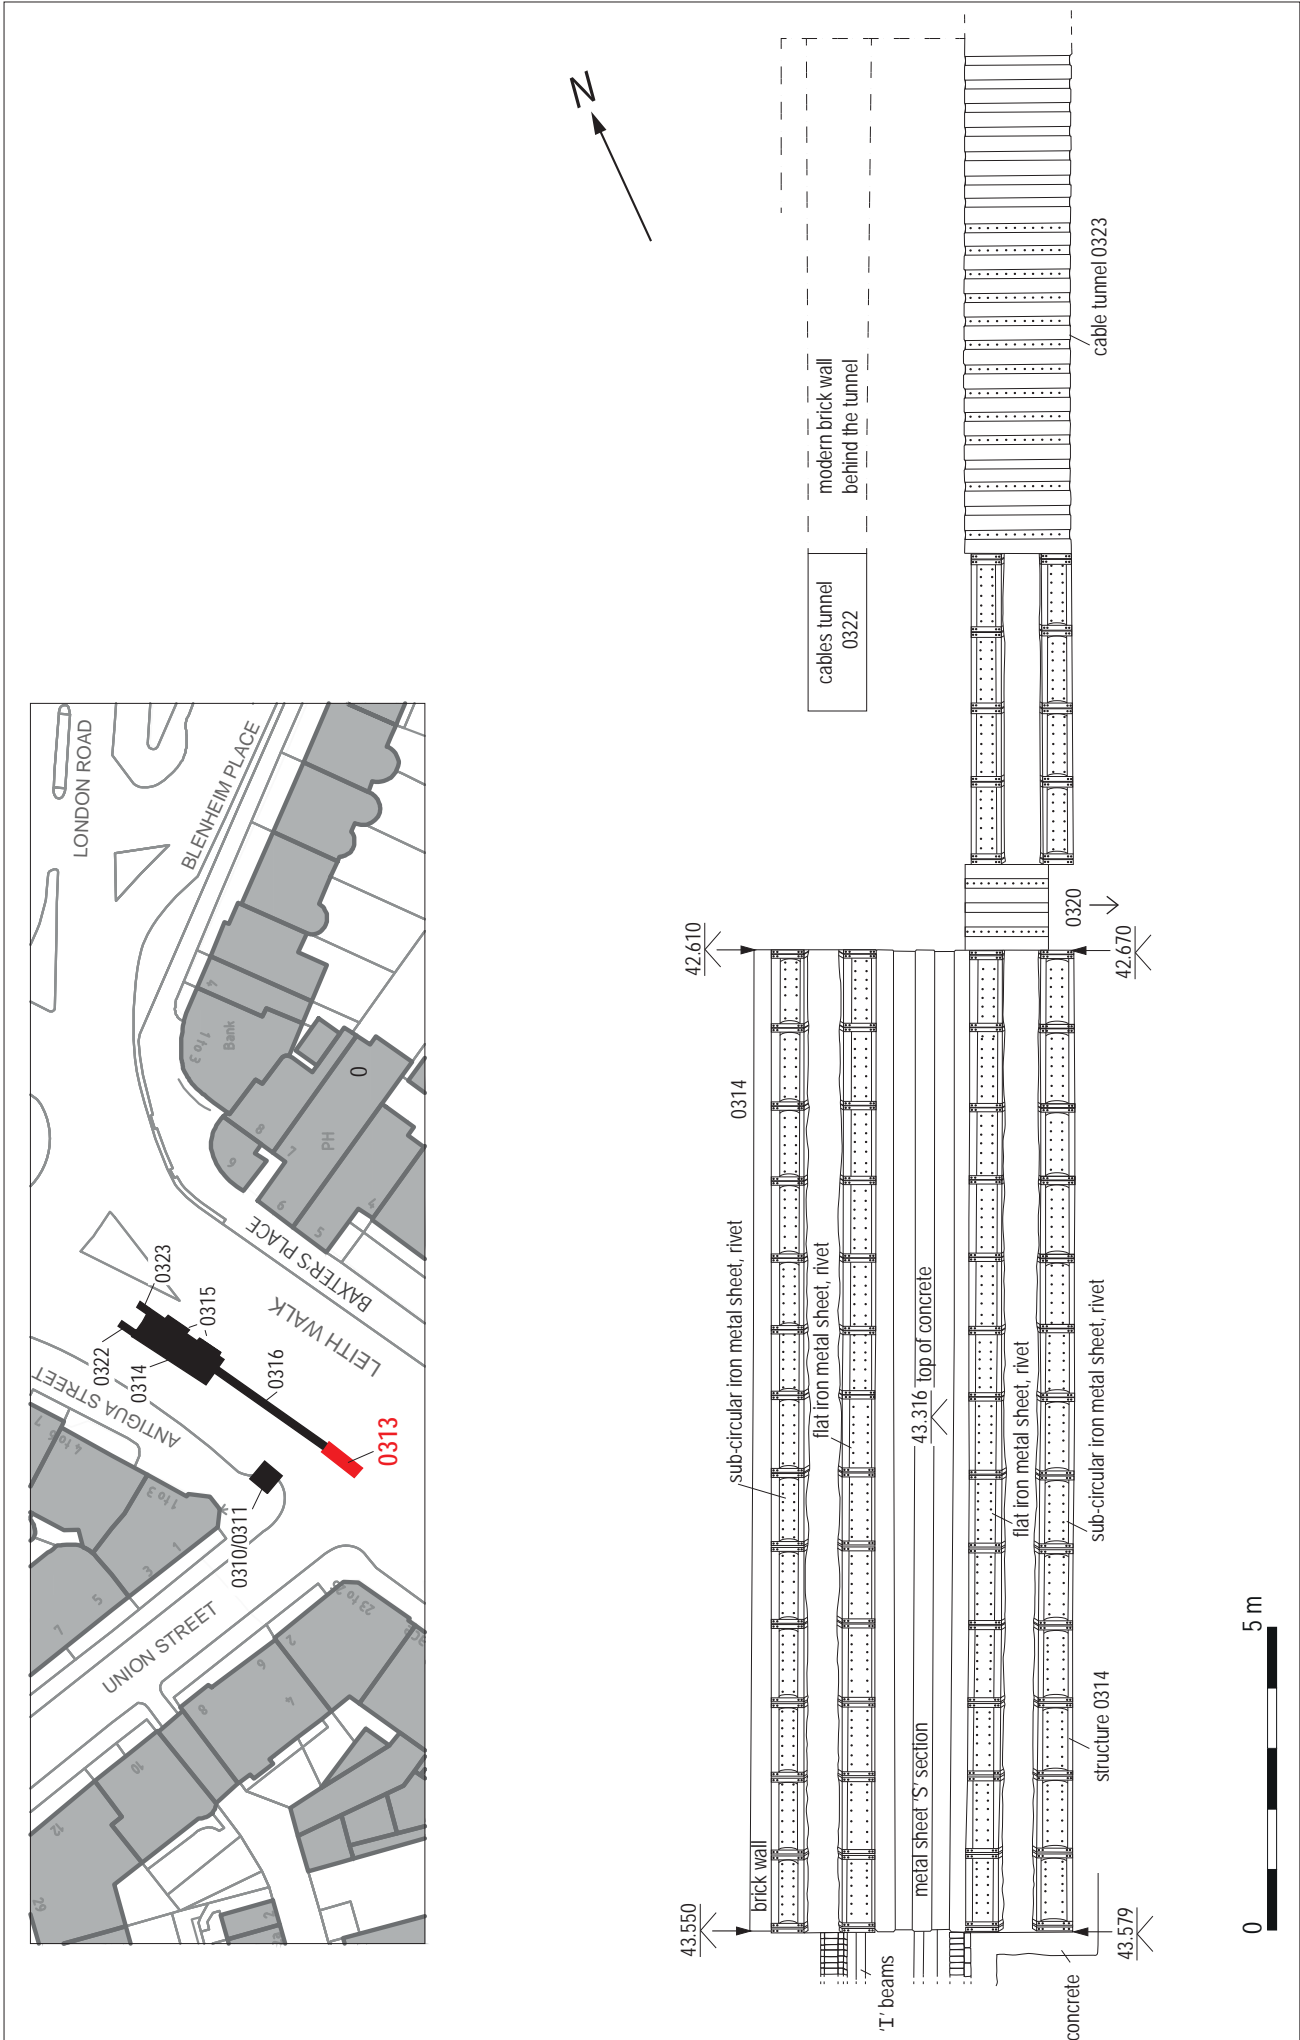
Plan of the surviving metal roof of the underground chamber at Antigua Street/Baxter's Place
